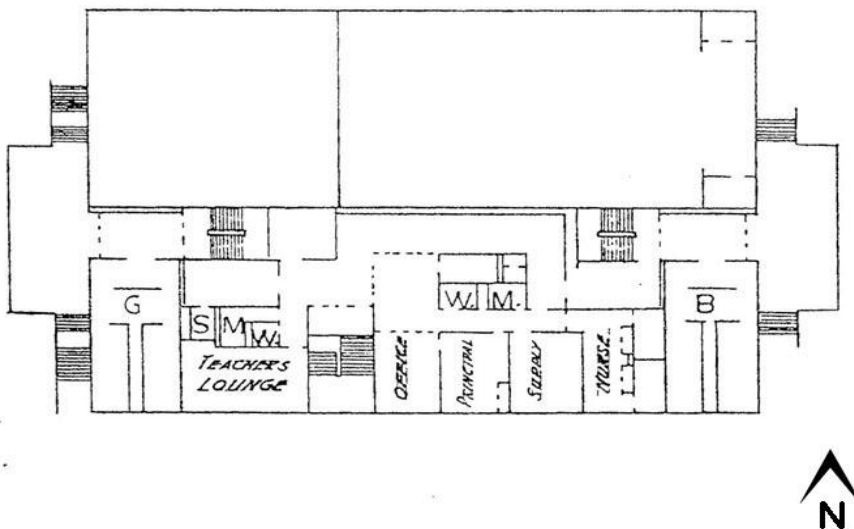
First Floor Plan, NTS. Cook School. Accessed from St. Louis Public Schools Building Revitalization Collaborative. Accessed July, 2021. <https://www.slps.org/domain/8785>.
